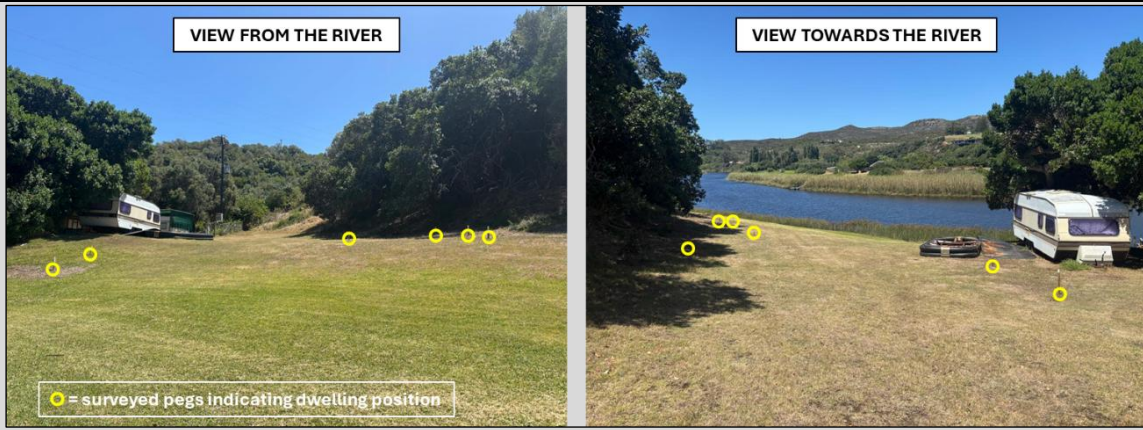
Photos illustrating the position of the proposed dwelling (yellow circles: surveyed pegs). As seen above, the proposed dwelling will be located on a grassed area outside Terrestrial CBA and Albany Thicket (CR) to the North and East.
